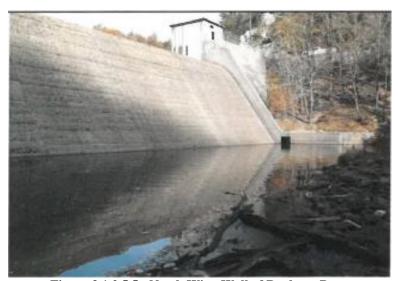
North Wing Wall of Roxbury Dam
